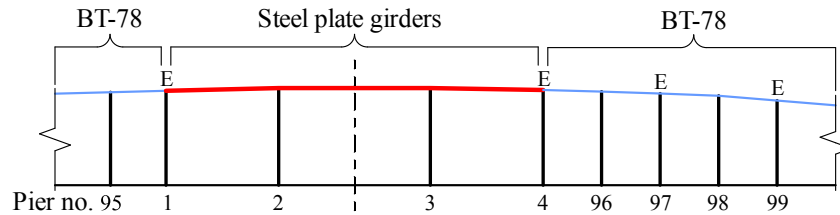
Overview of bridge span configurations ('E' indicates locations of expansion joints)
